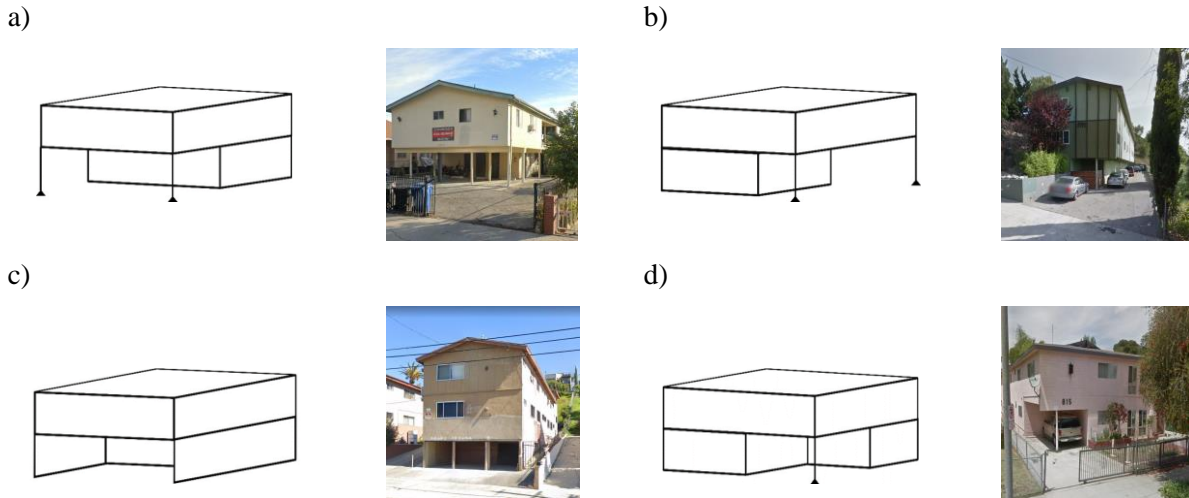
Schematic models for first-story wall layouts and their examples within Los Angeles SWOF wood frame buildings inventory for types a) L1, b) L2, c) L3, and d) L4
